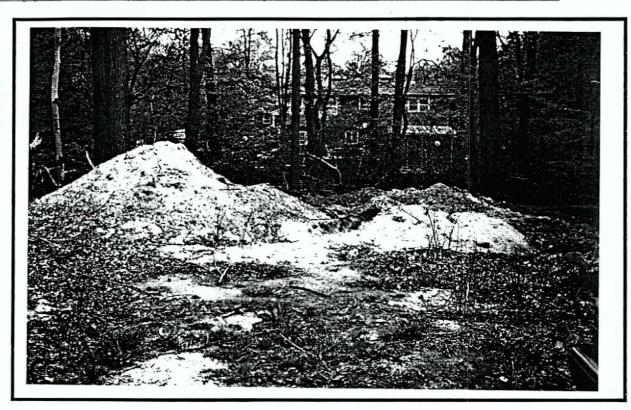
Sand and soil pile for septic sytem. Southwest corner of project area.
